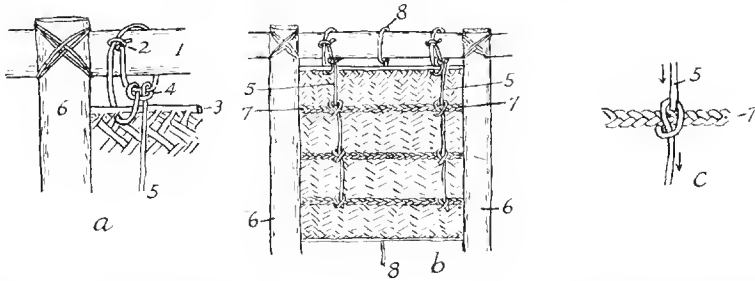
Attachment of wall screens: *a*, view from inside house. The two sennit cords are first tied to the wall plate (1) by the usual running noose commencement (2). The top sheet of the set always has the midrib edge (3) upwards. The braid is passed around the midrib from without in and then tied to its loop around the wall plate by two half hitches which form a clove hitch (4). The figure shows the braid loose, but in actual practice all loops are drawn taut. *b*, With both cords (5) tied, the top sheet is securely slung where the overlap on the two wall posts (6) is seen. The succeeding sheets are attached with their braided edges (7) upwards. The two cords (5) are brought down over the inner surface of the top sheet, passed behind the braided upper edge (7) of the second sheet, and brought through it below the braids from without inwards. The sheet is adjusted to slightly overlap the lower edge of the top sheet which is to the outside of it. The cords are pulled taut to this position and held against the upper edge of the second sheet by the left hand. *c*, The right hand passes the braid around its standing part from right to left behind it, and passes it through the loop formed. The knots are drawn taut, and the sheet secured as in (*b*). The other sheets are attached in the same way. A fourth sheet so attached is shown in the figure. The cord (8) is tied to the wall plate above the middle of the sheet. It is passed outwards above the top sheet so that it hangs down behind the sheets.
